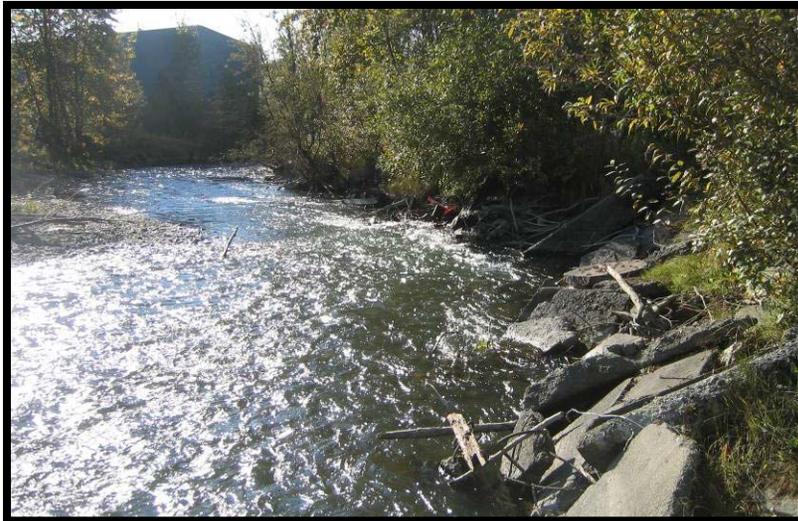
Reach 3, armored north bank with debris, rebar, and remains of railroad cars
